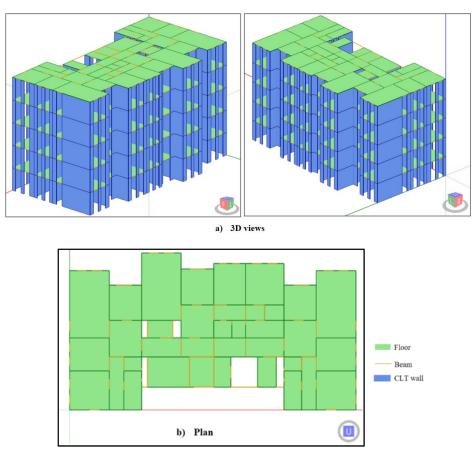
The model of a five-story CLT residential building a) 3D views and b) Plan
